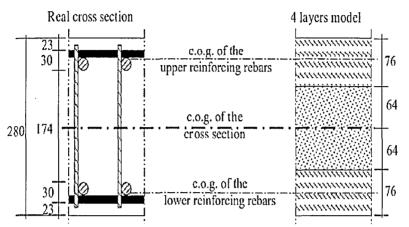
Cross section of the reinforced concrete structure with layers of the concrete.
